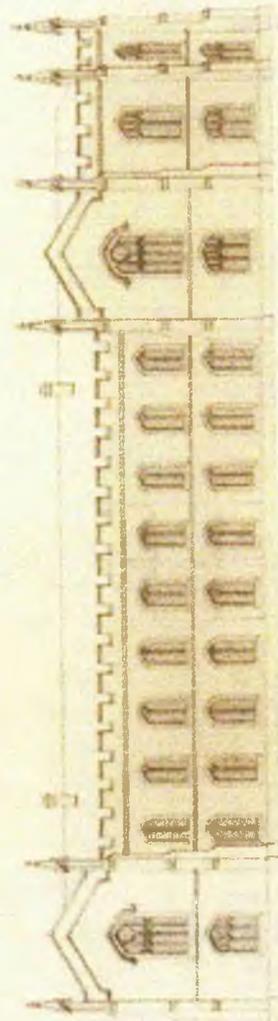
King's College. East elevation refronting east wing and reconstruction of Cromwell Tower. J. Smith, 1822.
